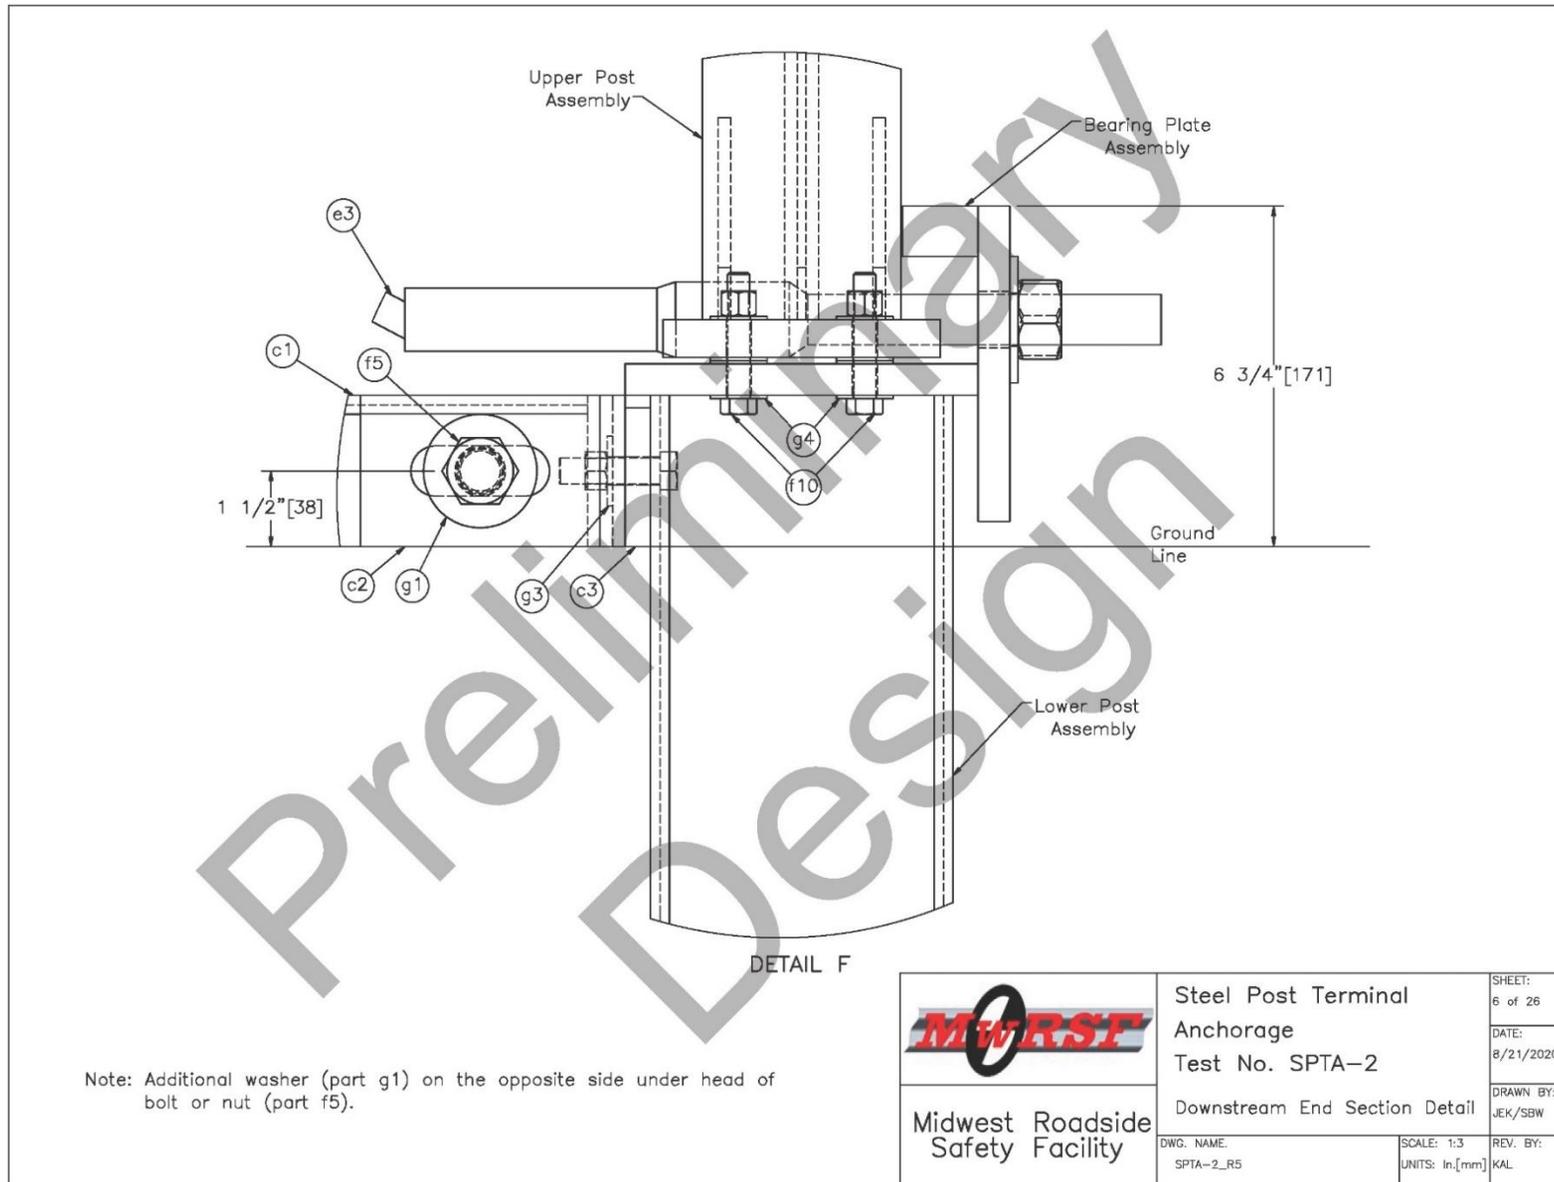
Downstream End Section Detail, Test No. SPTA-2
